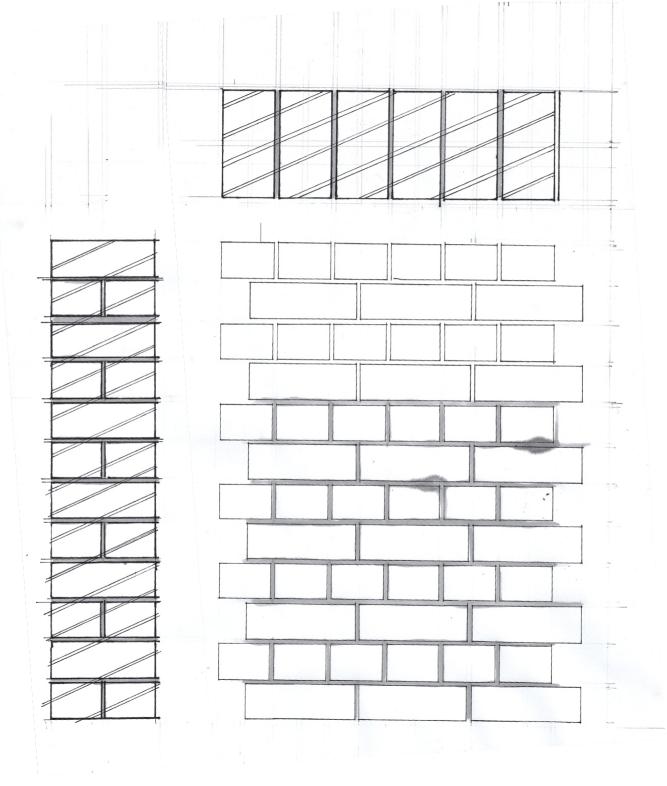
Section, elevation and plan of existingenglish bond of the majority of buildings on site
